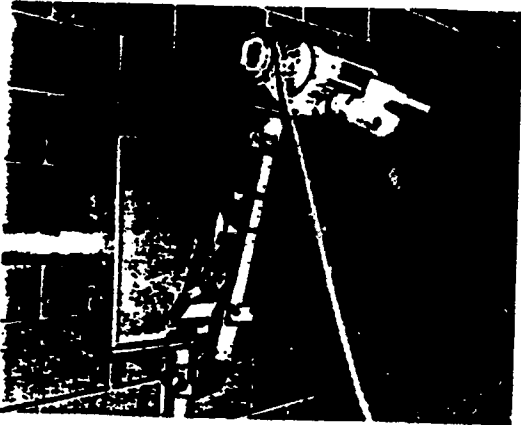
Used to pull larger cables and wires into place. (Greenlee Tool Division, Ex-Cell-O Corporation).
